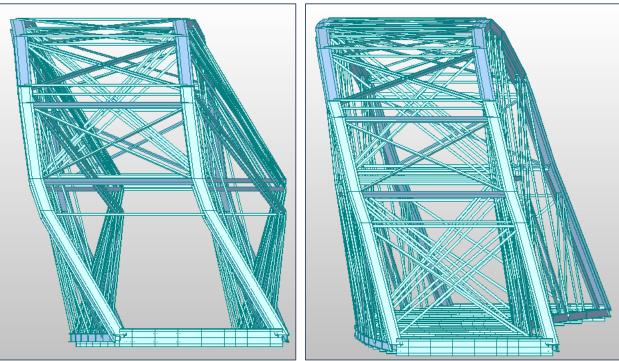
250' Through Truss without Temporary Bracing (left) and with Temporary Bracing (right). (Truss Deflections are Exaggerated to Illustrate Deflected Shape)
